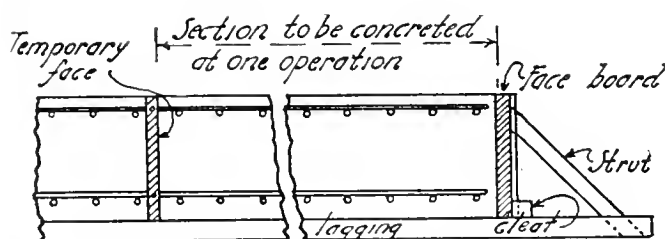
Use of Temporary Board Facing in Longitudinal Concreting of Arch.
